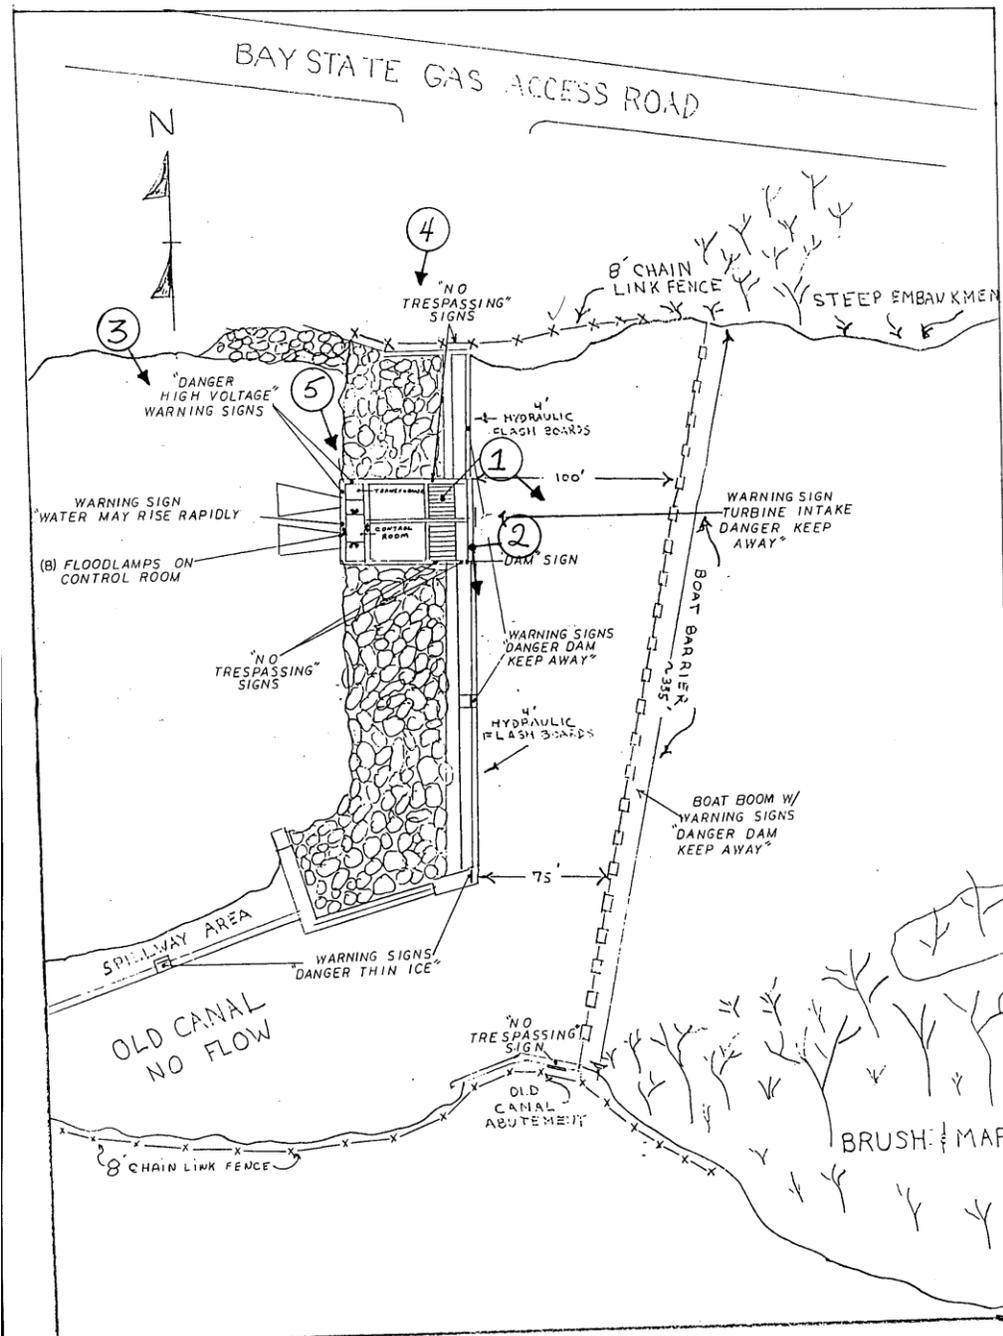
Project layout. (Source: 2001 FERC inspection report)
